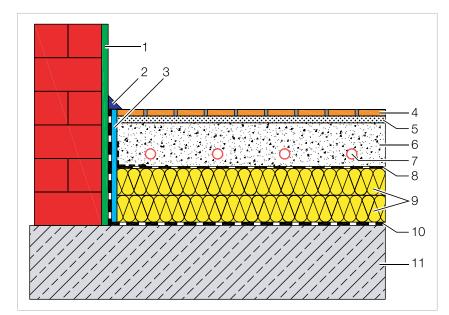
Cross-sectional example of underfloor heating and cooling system with wet construction
